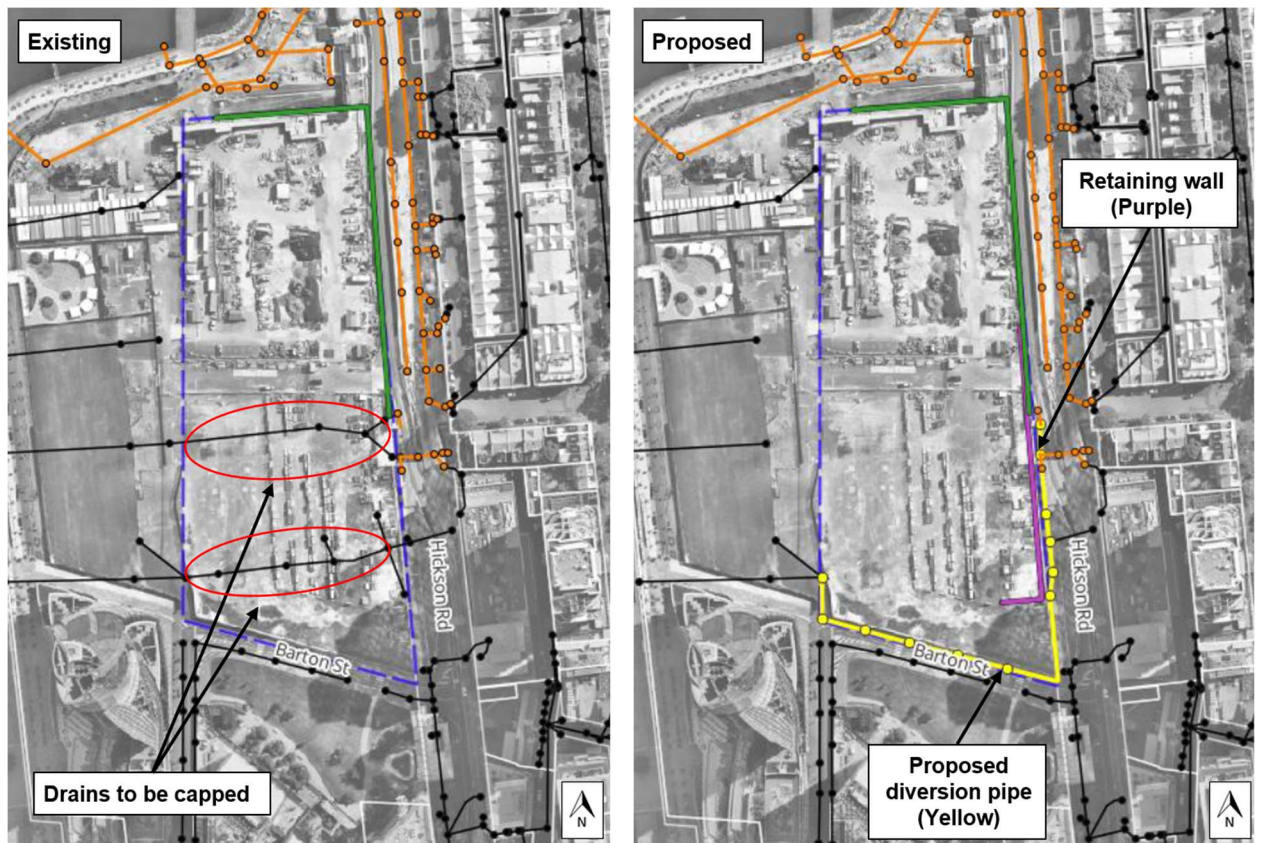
| Existing and proposed stormwater network layout – interim works in yellow (Source: RFI)
